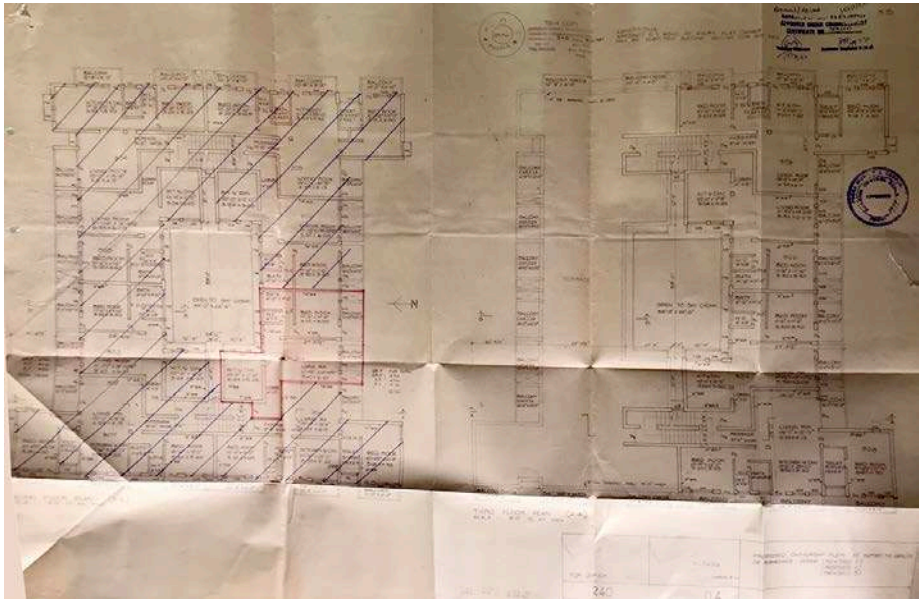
Third revised permit plan of Jayanti Apartments, canceled housing units on the top floor level have been hatched. Source: private office archives of architect V. V. Badawe.
